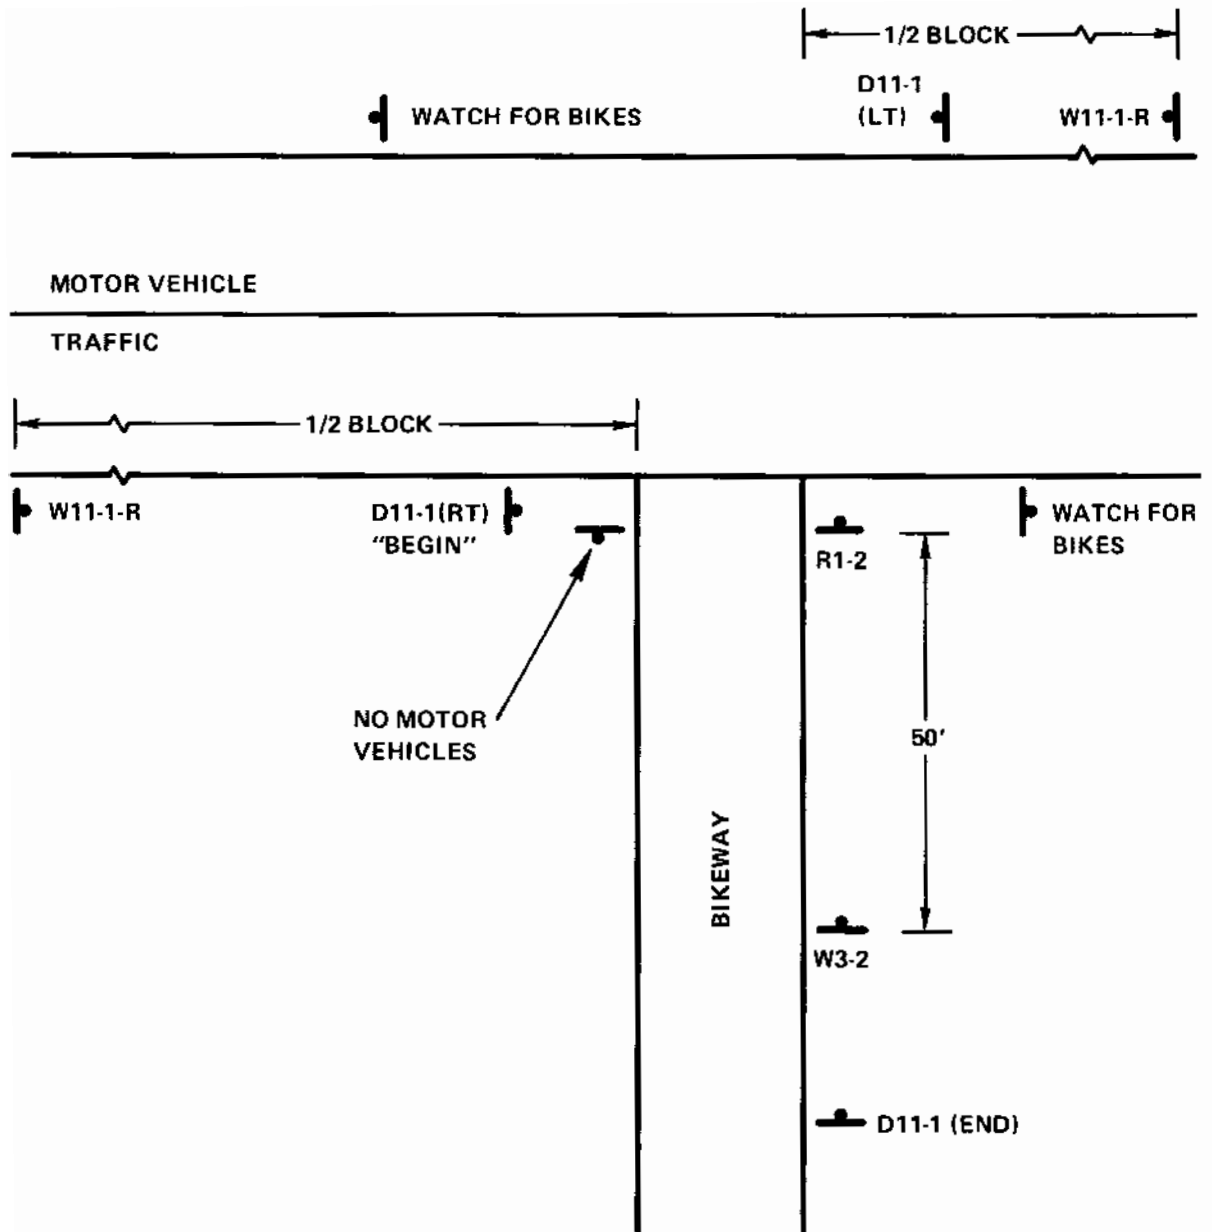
Signing Plan for the Beginning and Ending of a Class I Bikeway
